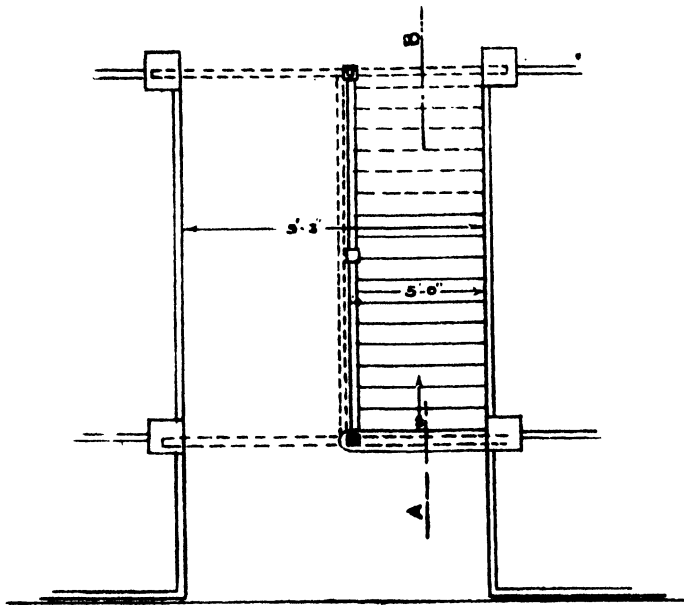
DETAILS OF R. C. C. STAIRCASE (CANTILEVERED)
